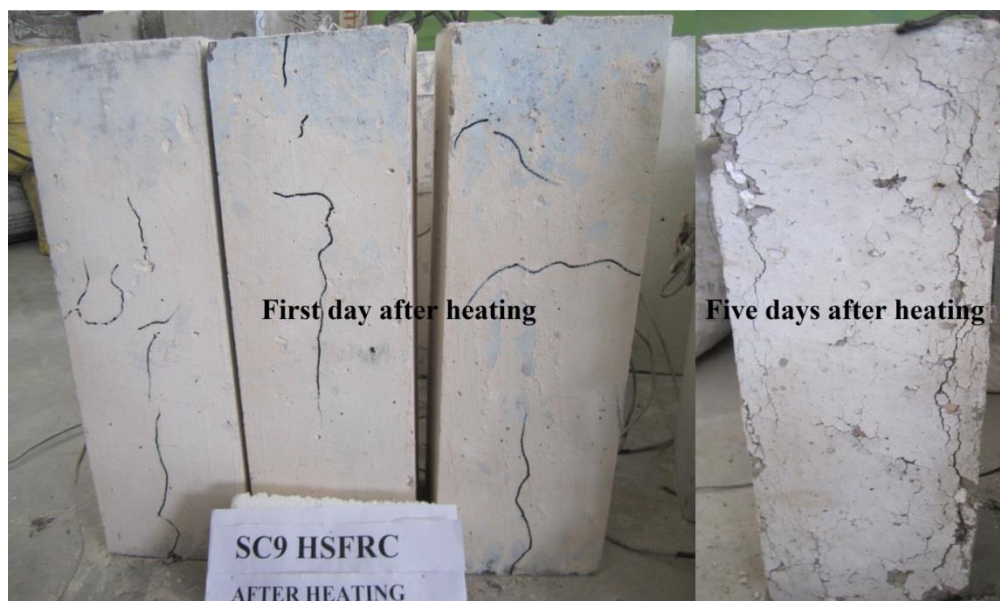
Surface cracking observed in test specimens exposed to 900 °C
